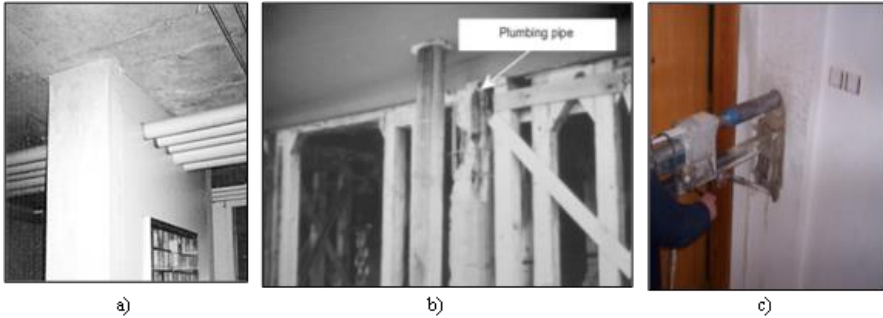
RC-Column which have hole(s); a) Horizontal holes drilled for building services (Son, etal., 2006), b) Vertical hole in RC-column as a plumbing pipe, “earthquake damage sustained by columns containing plumbing pipe”, (Son, etal., 2006), c) Core drilling at RC-column of a building by a portable drilling machine, (after Kurtulus&Bozkurt, 2011).
